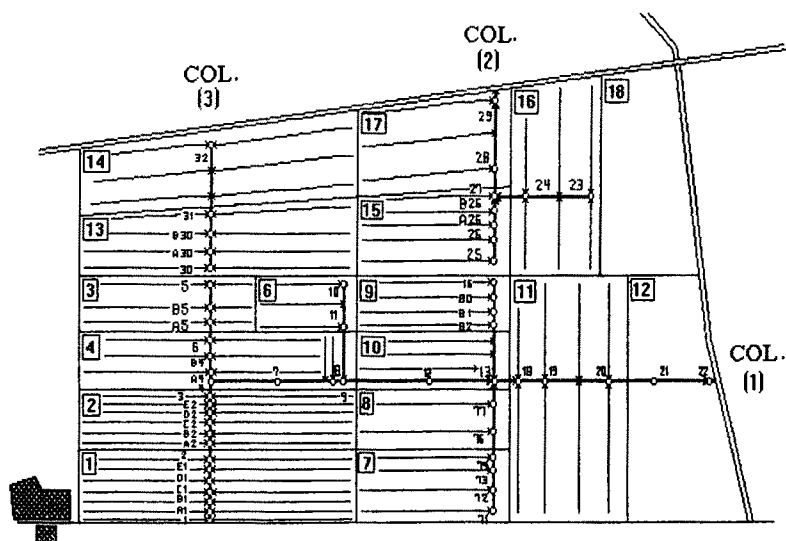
Layout of Subsurface Drainage System at MPA and Drainage Units
